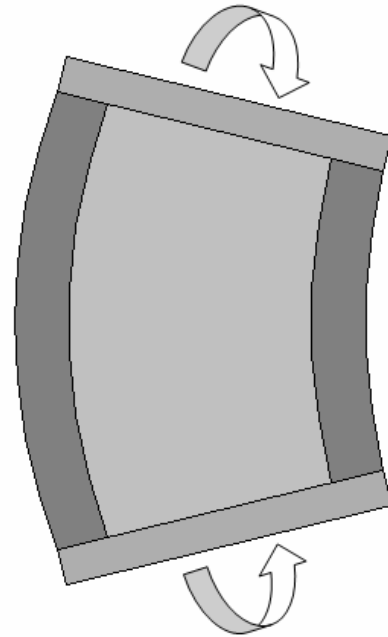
Eccentric Load or Moment on Straw Bale Wall
